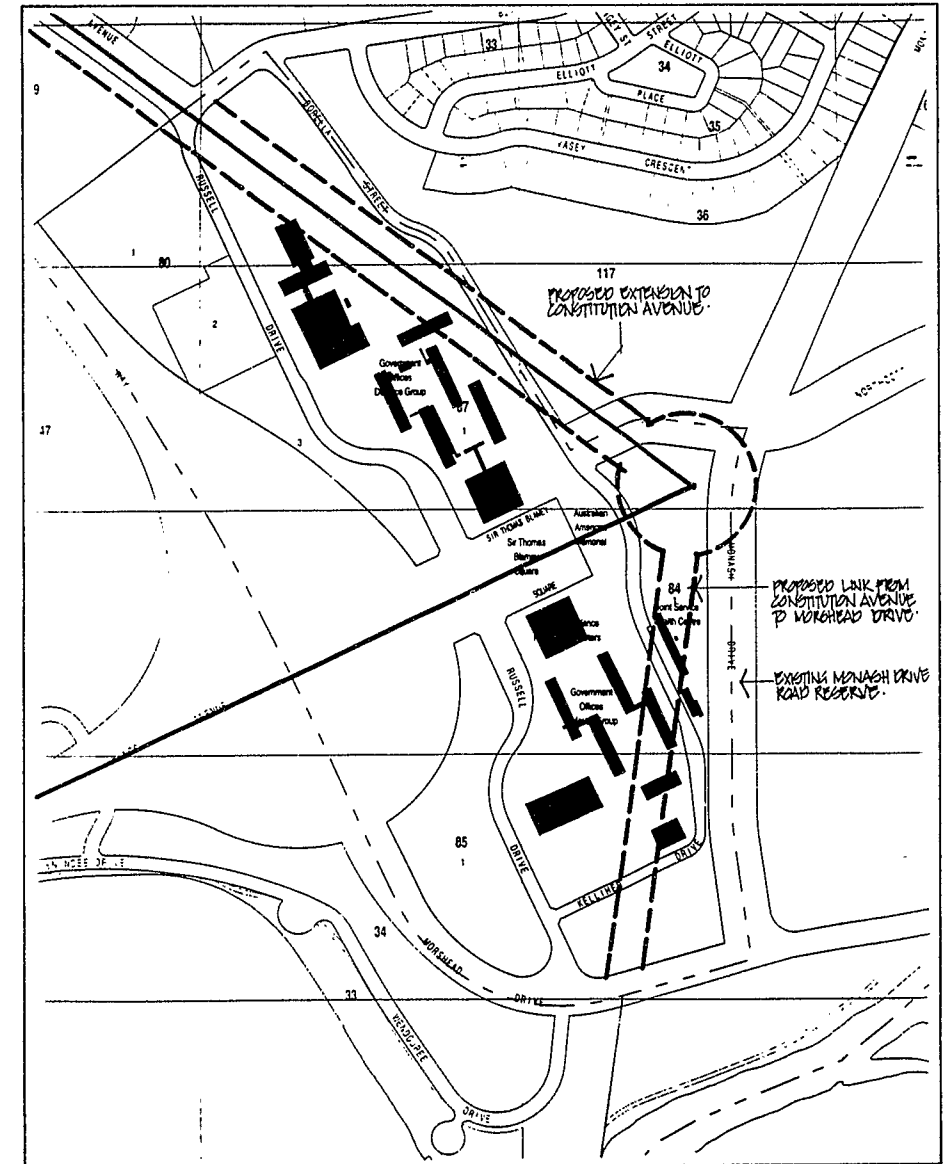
Constitution Avenue and link road to Morshead Drive masterplan
